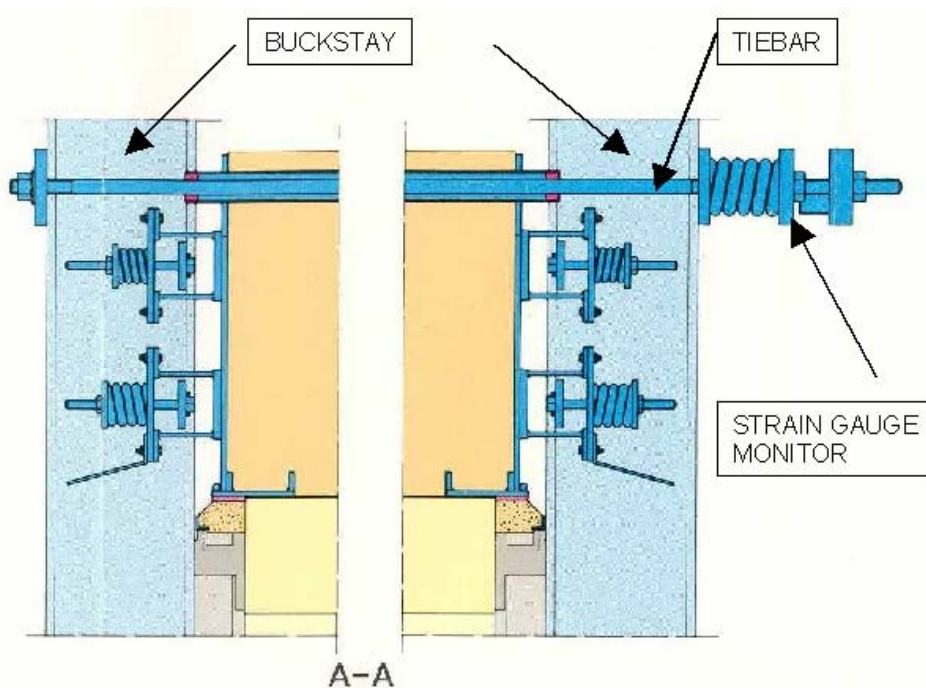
Sectional elevation of coke oven detailing the tie-bar/buckstay arrangement
